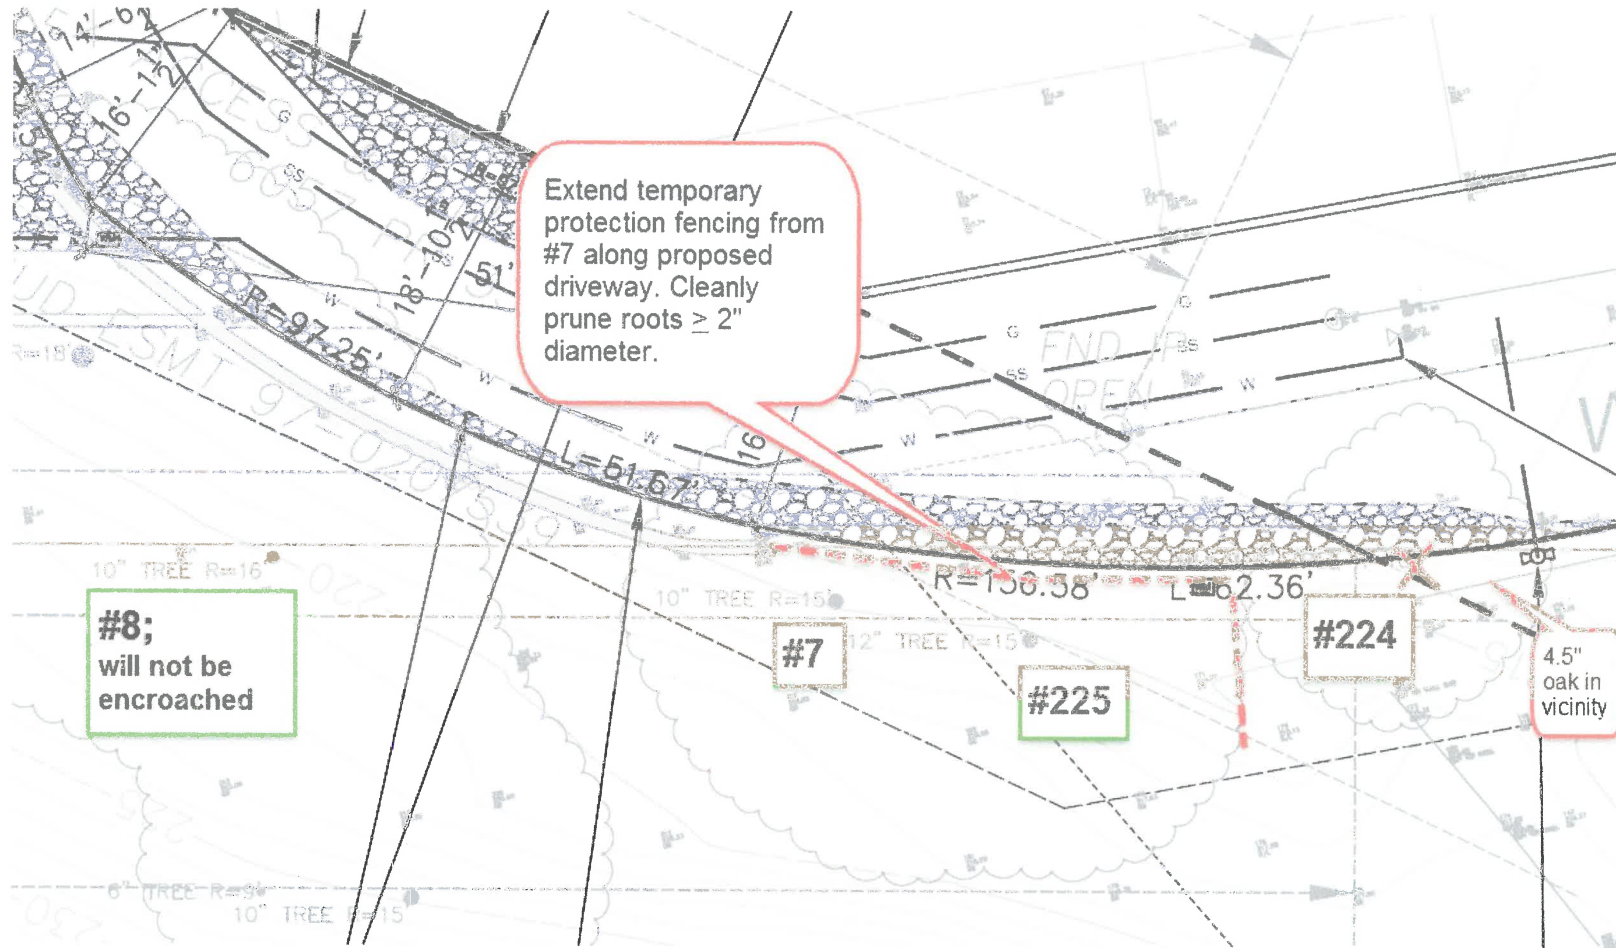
Most recent plan showing new driveway, with updates to tree protection recommendations.
